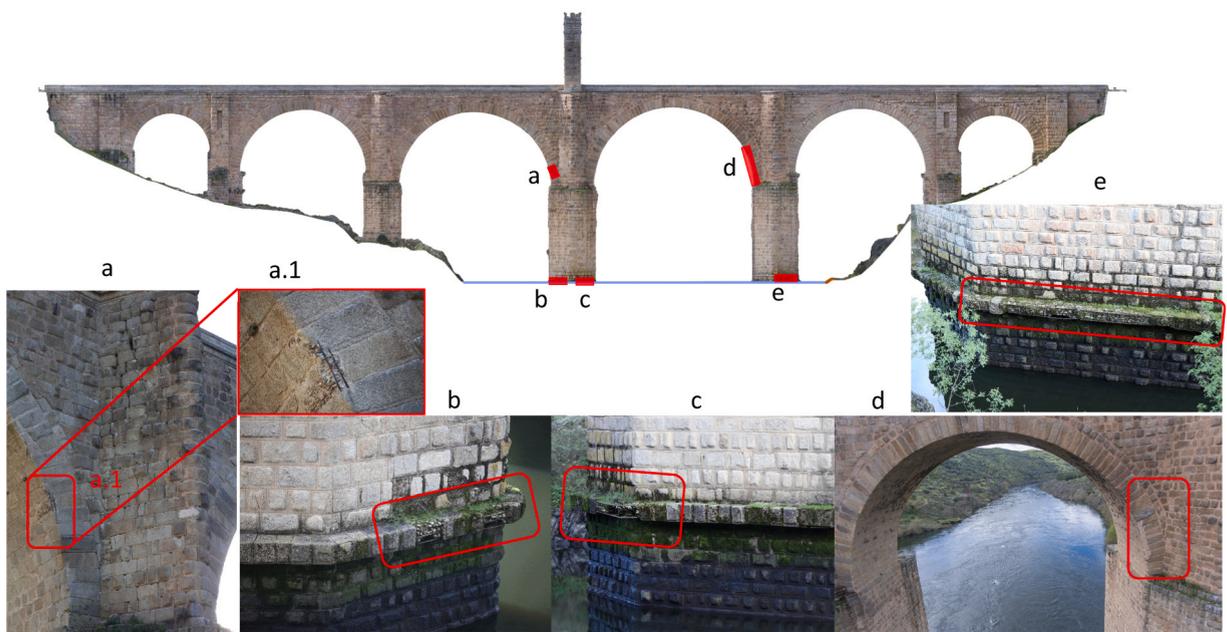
The central figure shows the orthophoto of the upstream elevation in which some of the areas where concrete and reinforced concrete have been used are highlighted. Figures a) to e) show detailed images of these interventions.
